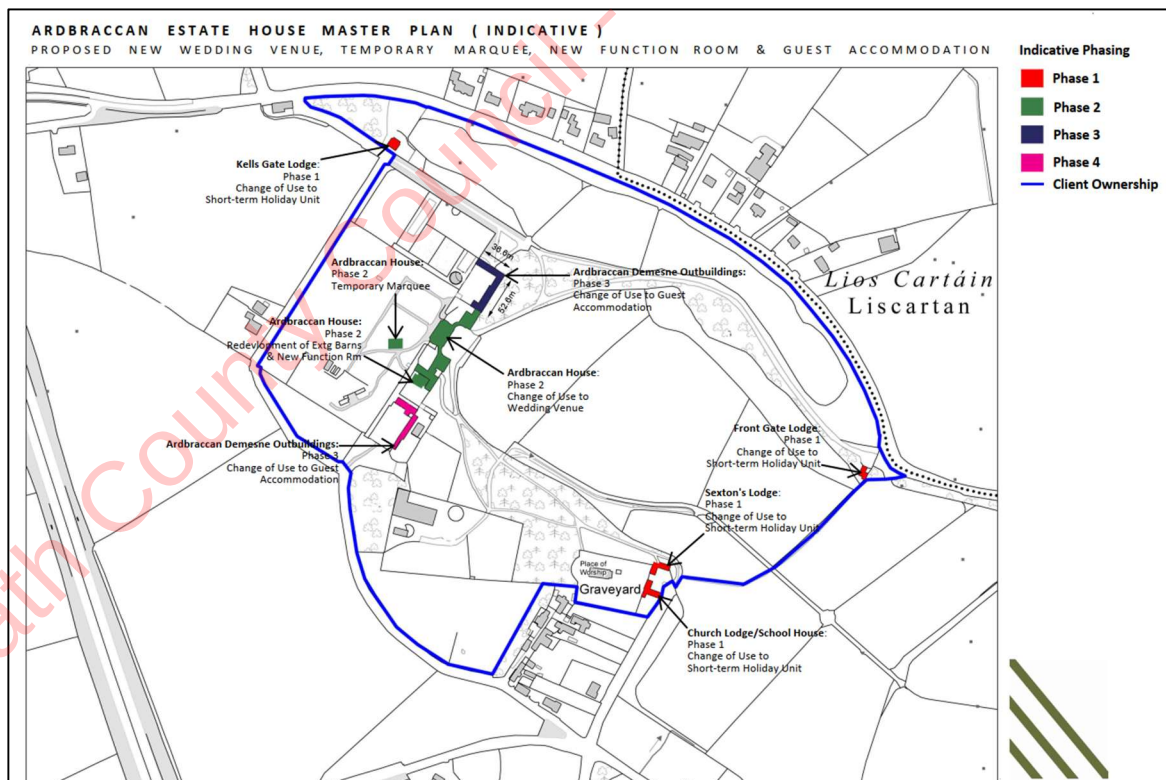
Ardraccon Estate House Masterplan and Sexton's Lodge Location (Source: Rafferty Architects & Conservation Architects)
